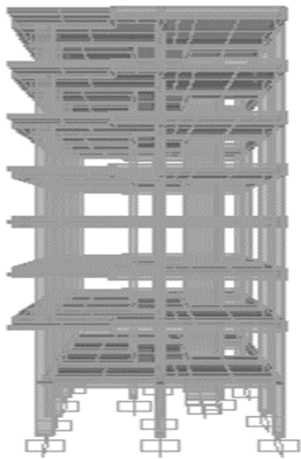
3-D finite element model of the reinforced concrete shear wall building
